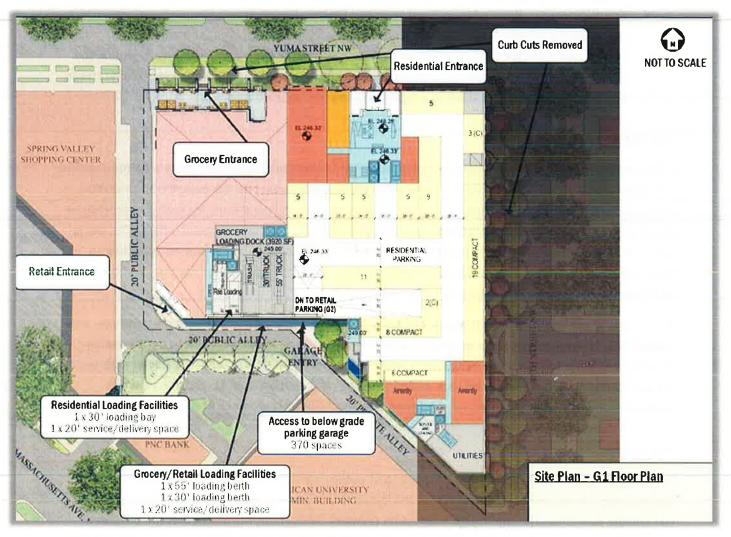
Site Plan (Source: CTR, Gorove/Slade, Figure 8, 11/22/17)
